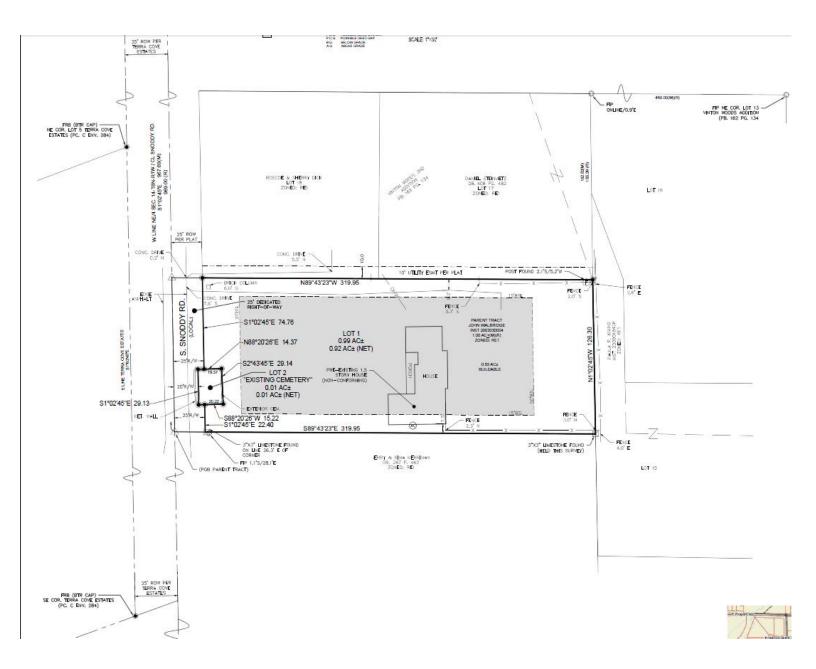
Walbridge Type F Administrative Subdivision Plat
